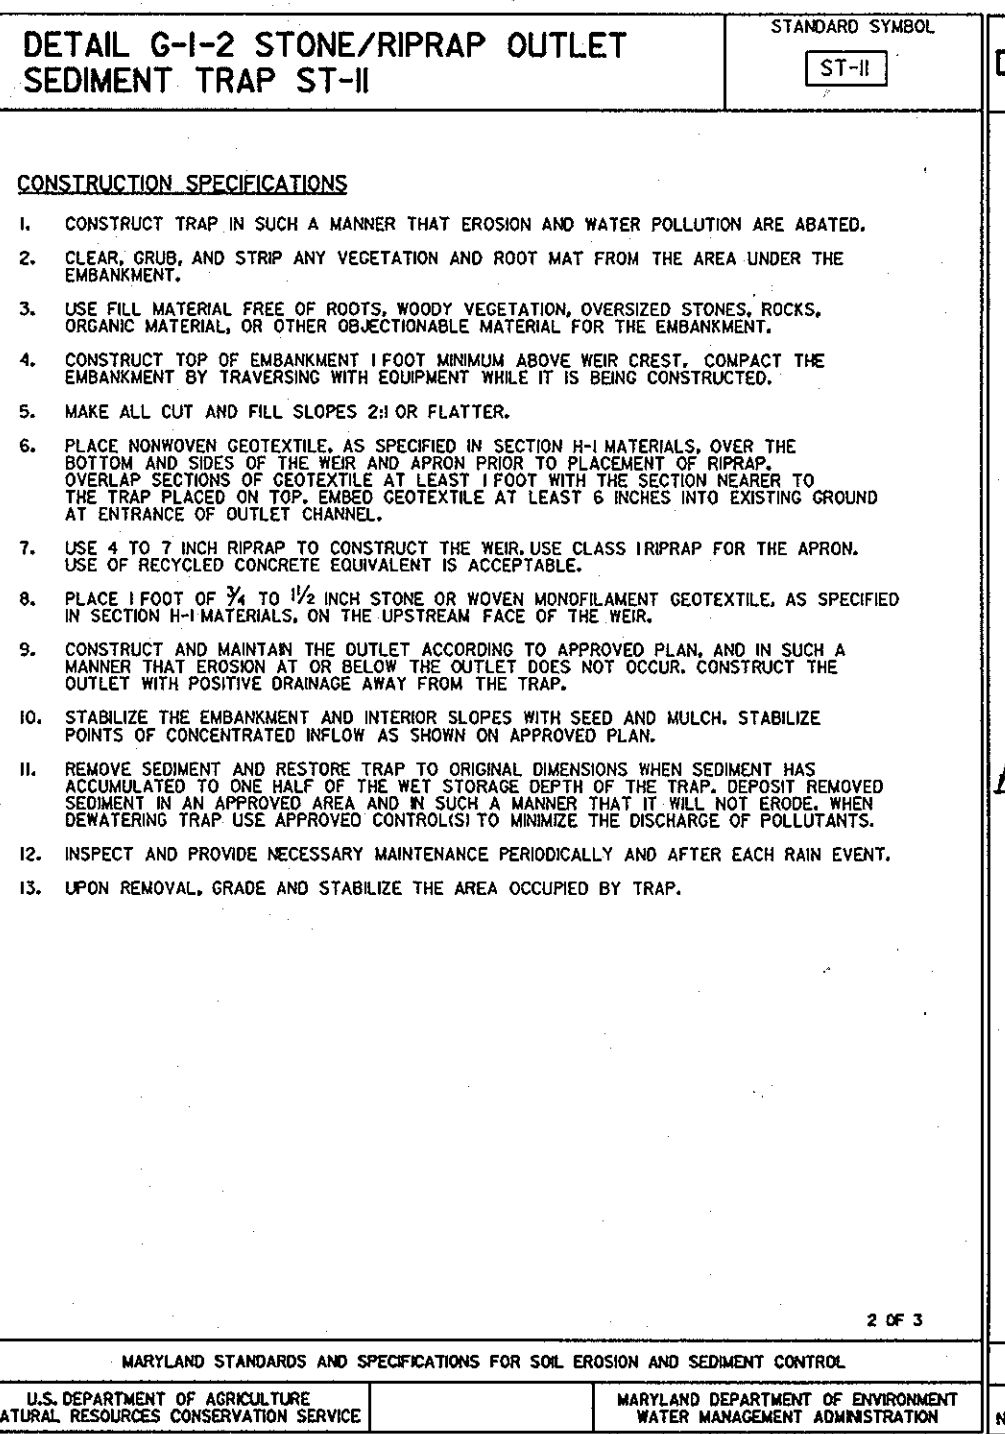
STONE/RIPRAP OUTLET SEDIMENT TRAP ST-II
